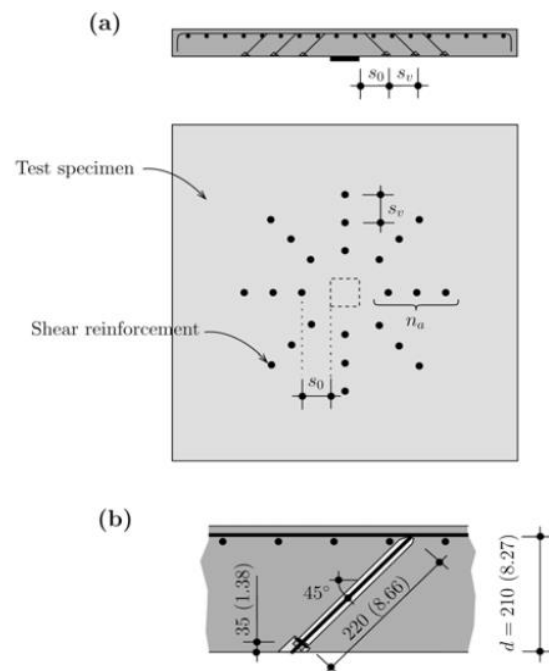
Layout of Inclined Shear Bolts: (a) Cross Section and Plan View; and (b) Dimensions of Shear Reinforcement (Dimensions in mm [in.]).
